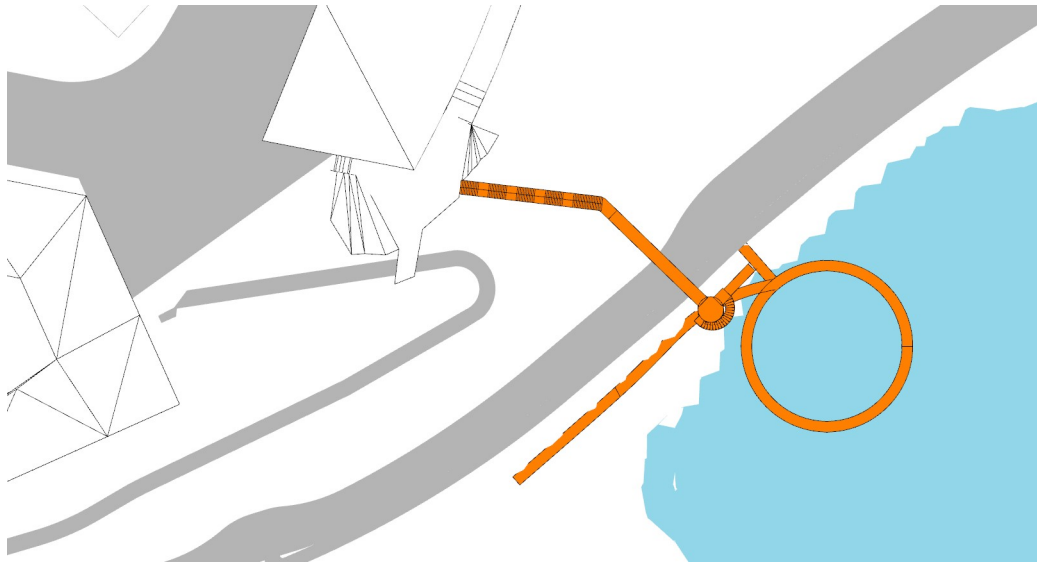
Plan view of the final design proposal illustrating the sight line from the city square and Lakehouse to the lake.
